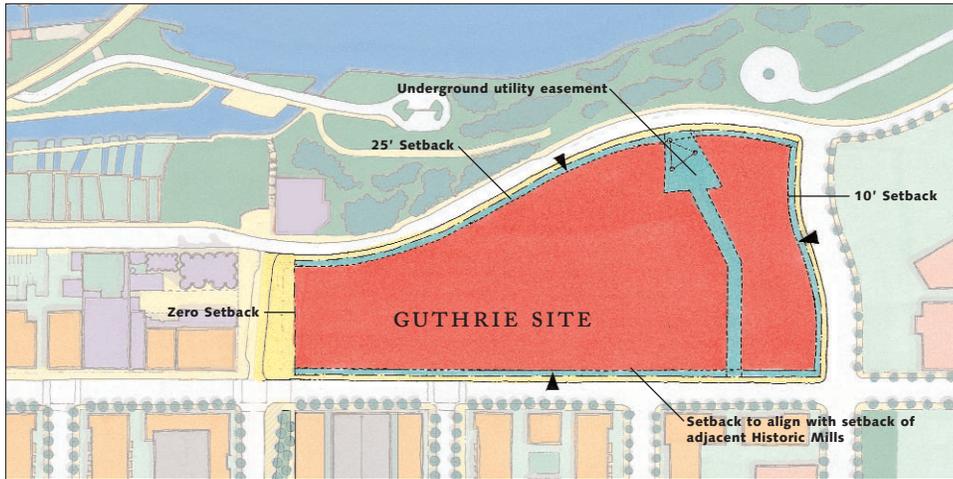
Minimum Required Set Backs from public right-of-way: An element of the future design, not necessarily structural, should attempt to frame the view looking up Chicago Avenue to the river. The building's west facade should define the plaza so that in conjunction with the Washburn A Mill, the view to the river is adequately framed.
